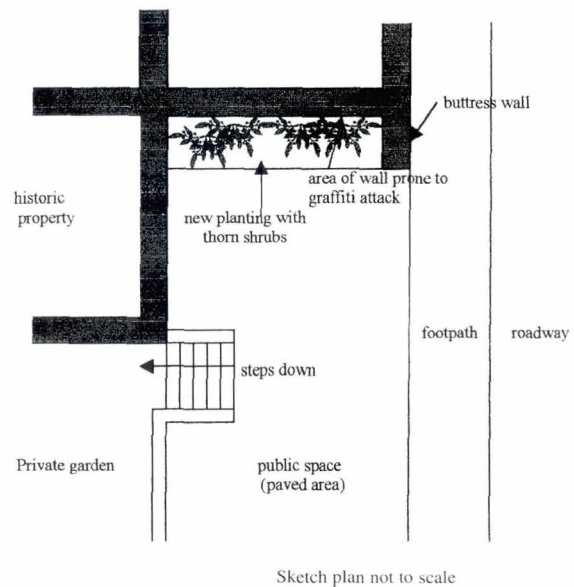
Plan view of public space with new planting to deter graffiti attack.
